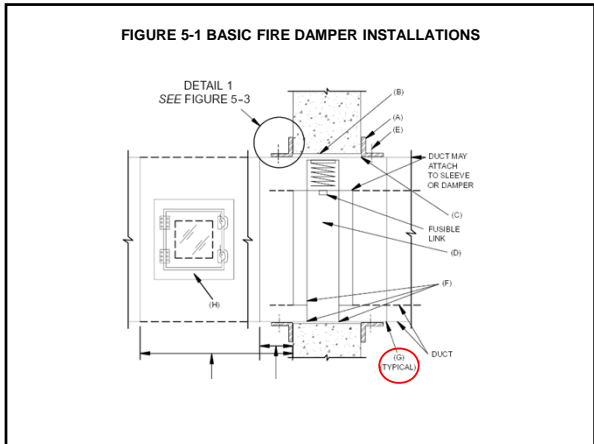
BASIC FIRE DAMPER INSTALLATIONS
